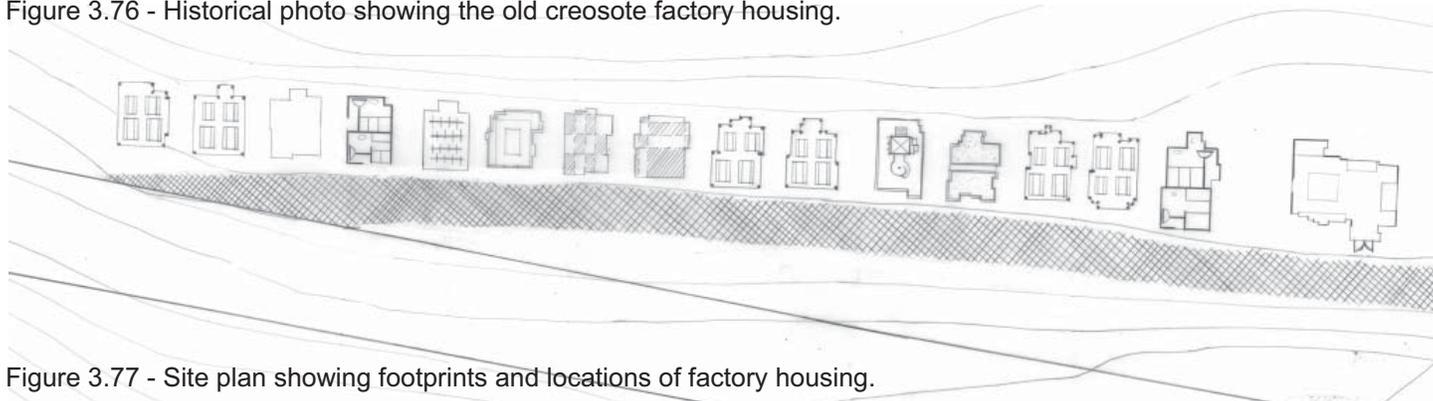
Site plan showing footprints and locations of factory housing.
